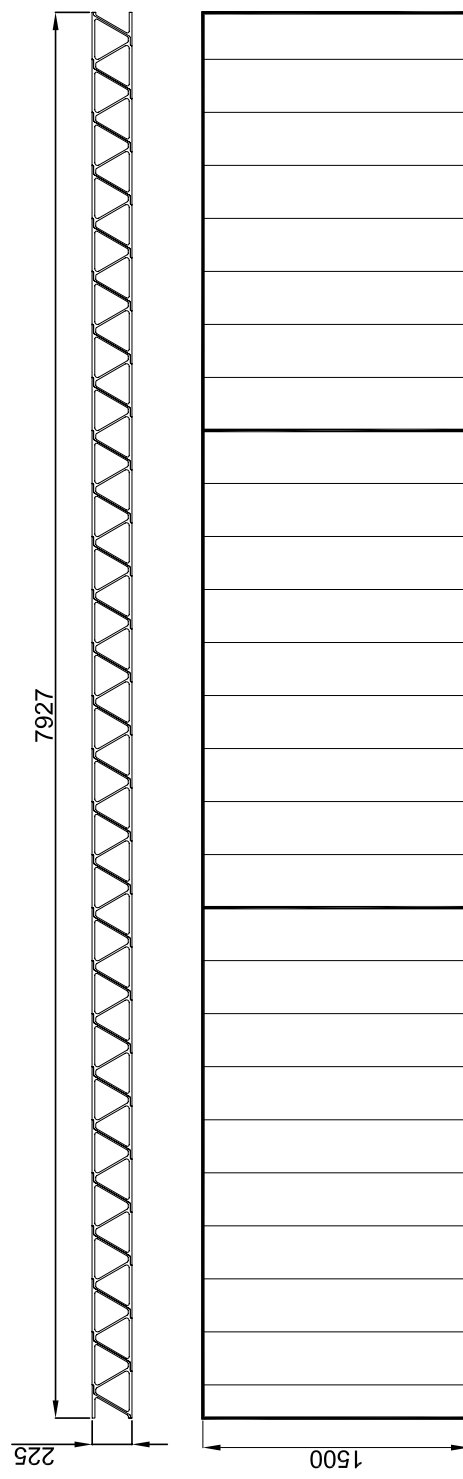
Overall dimensions of ASSET bridge deck (SikaDur 330 joints shown in bold)
